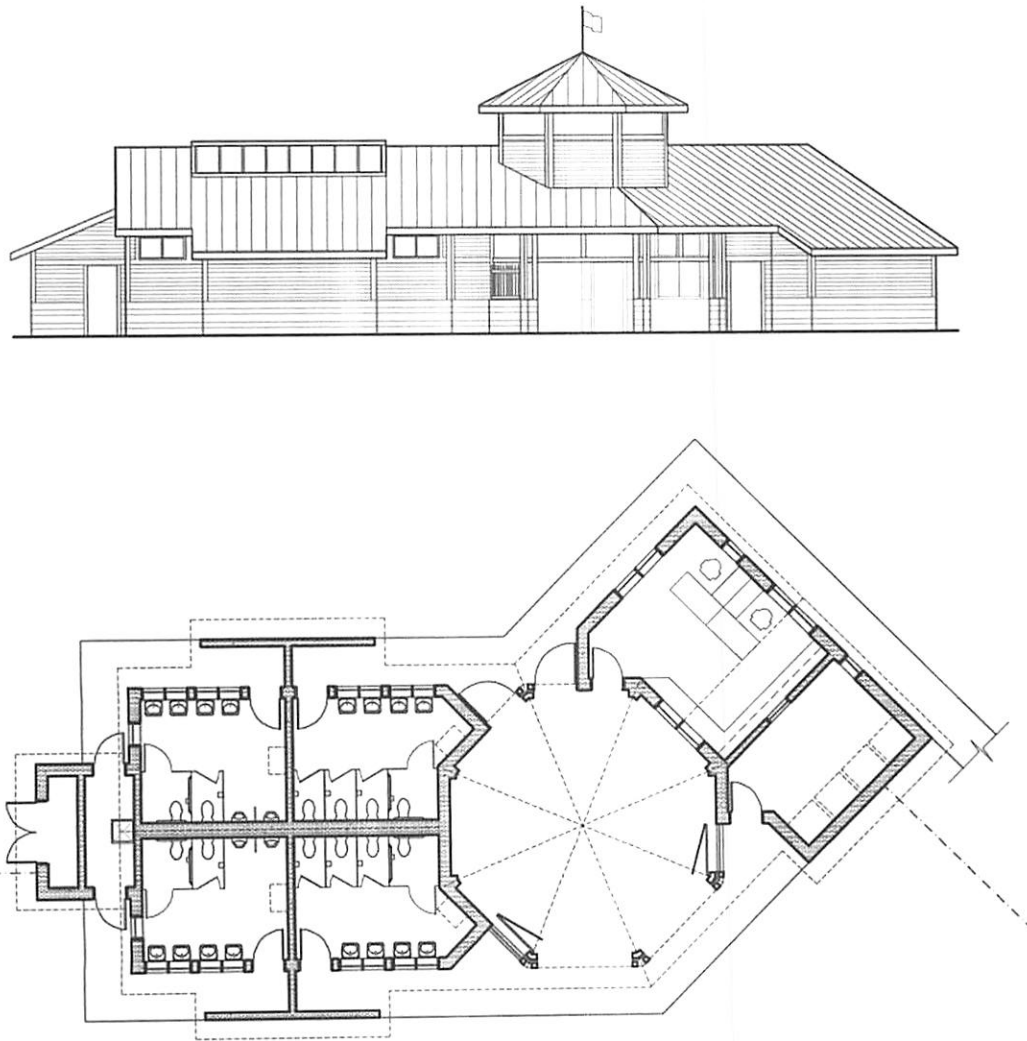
Gateway Building, elevation and plan (DPK&A Architects, LLP)
